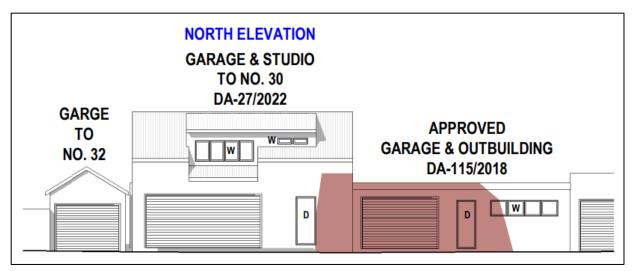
Proposed shadowing June 21st at 9am across the northern elevations of the properties directly south of the subject site, across Barnett Lane. The red denotes the area of proposed additional building shadow.
